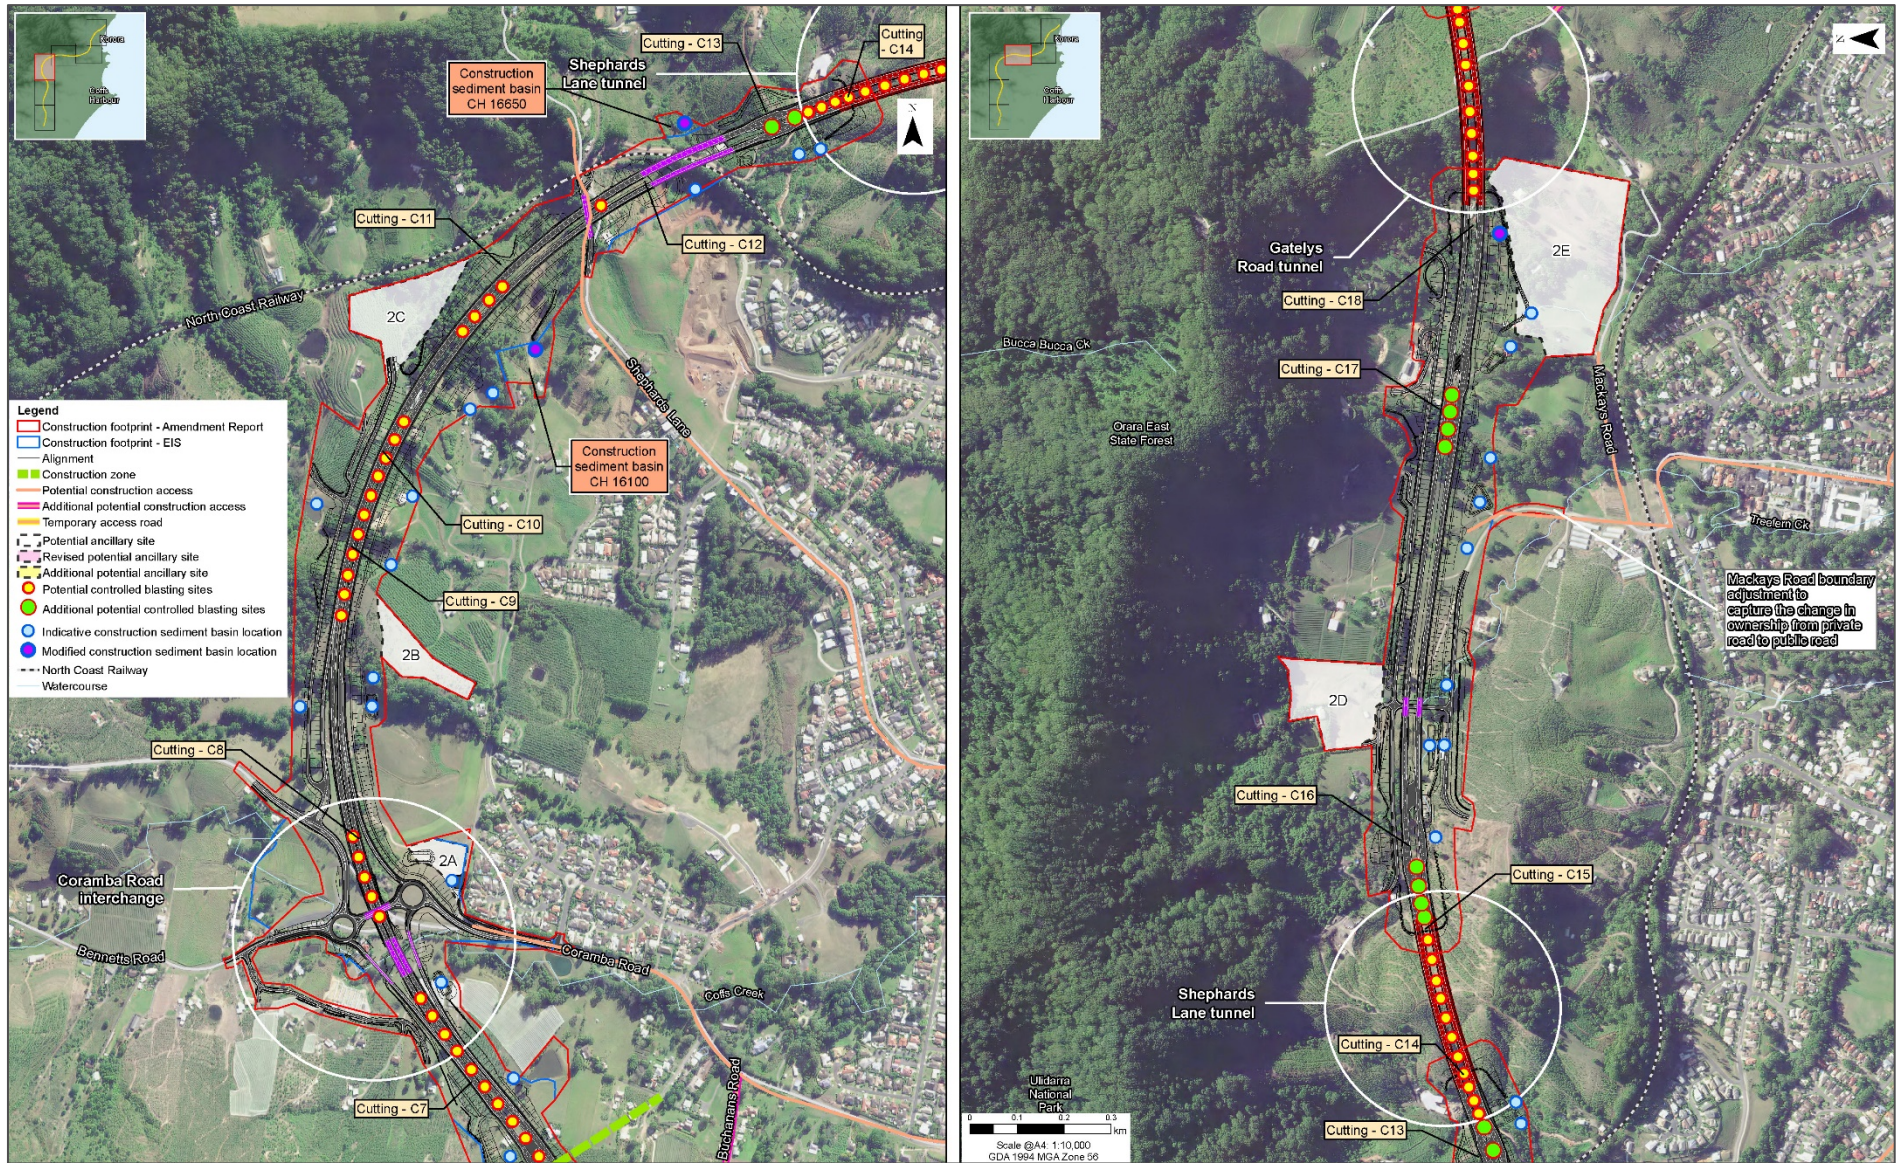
| Location of construction ancillary sites (Source: Amendment Report)
